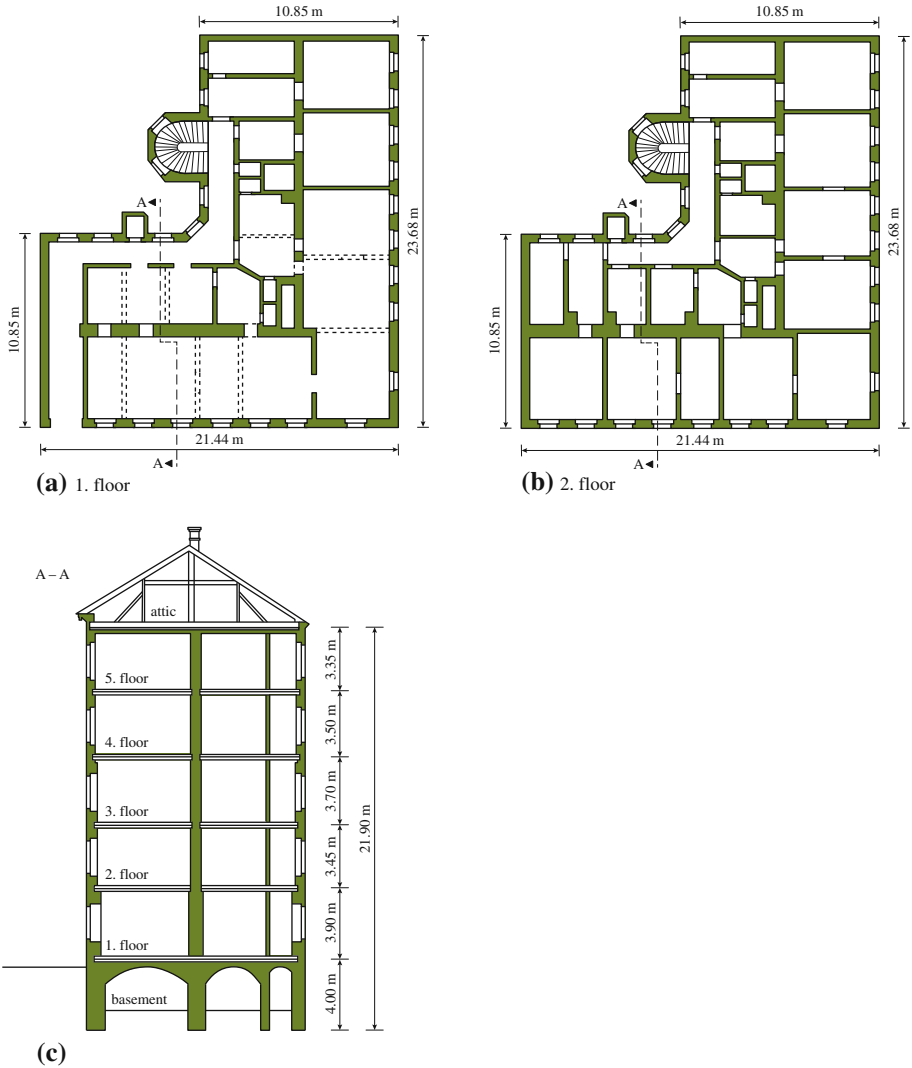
a Floor plan of the 1st floor, b floor plan of the 2nd floor, and c section of the object “Währinger Gürtel 164”
